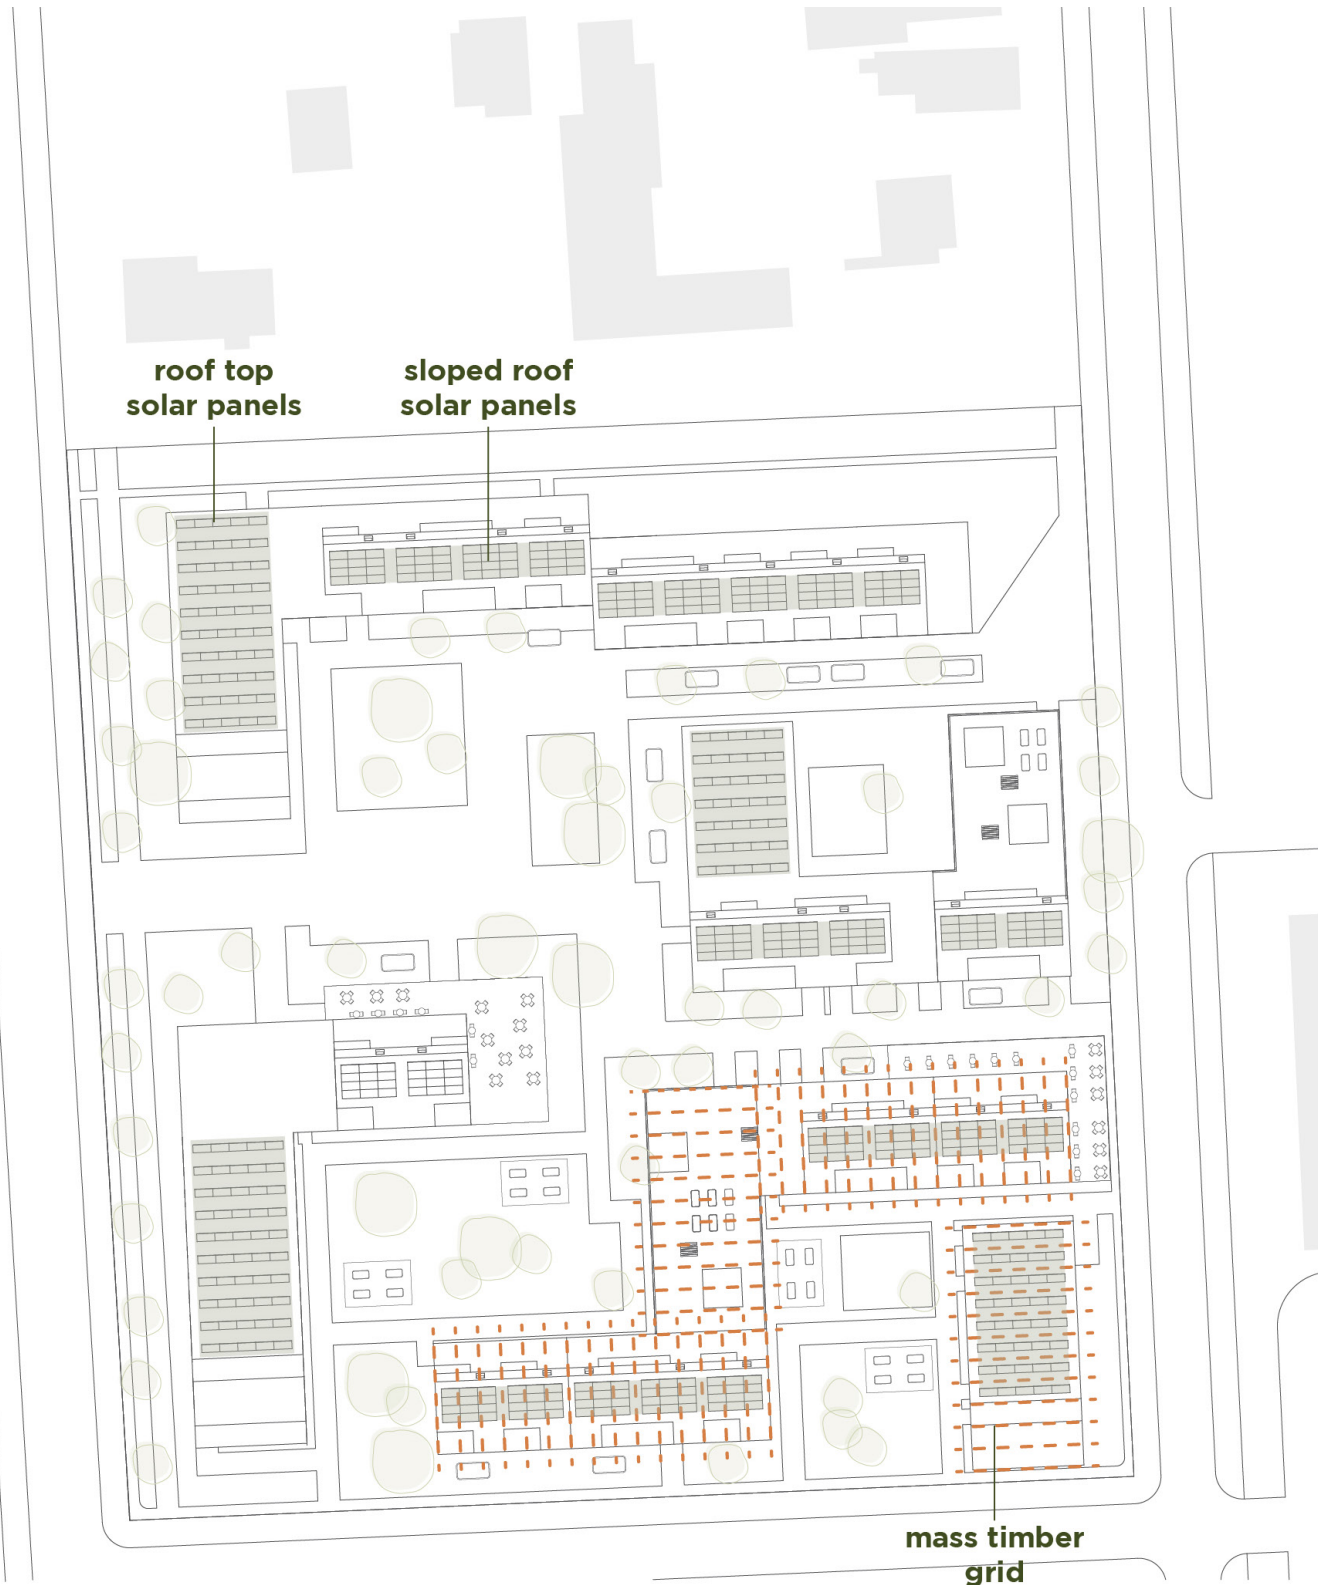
Roof plan highlighting locations of solar panels and mass timber grid
